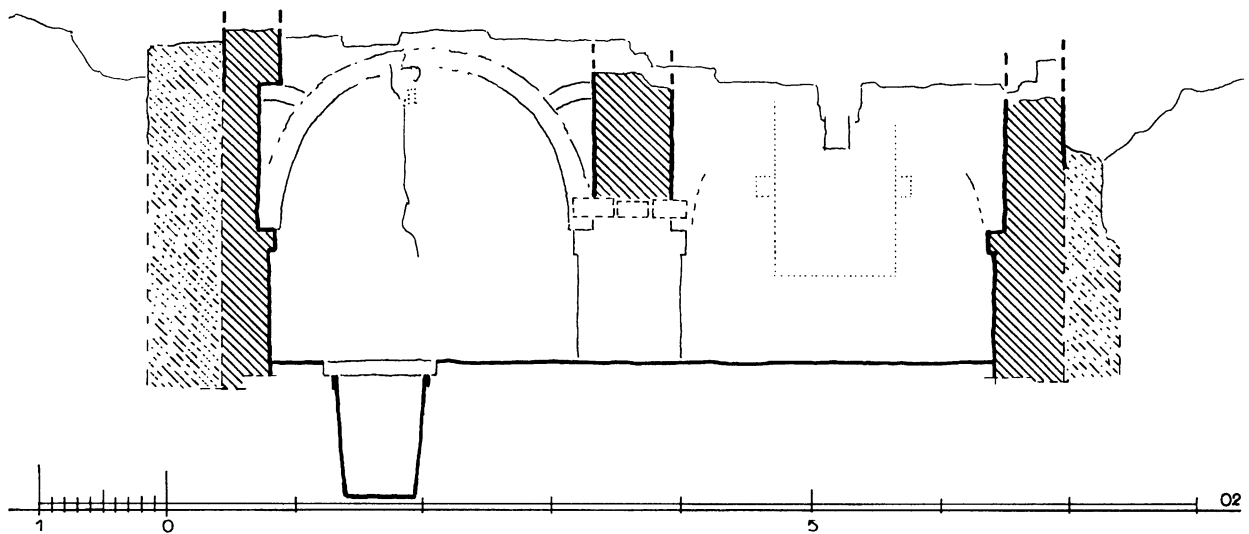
Transverse section through the underground cooling chamber (looking west)
